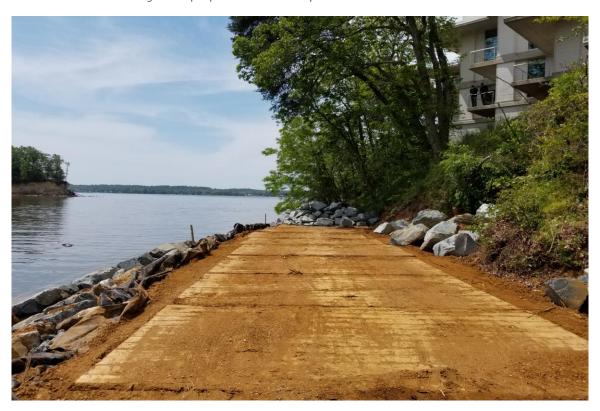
End of access road with rip rap stock pile (facing S perimeter)
